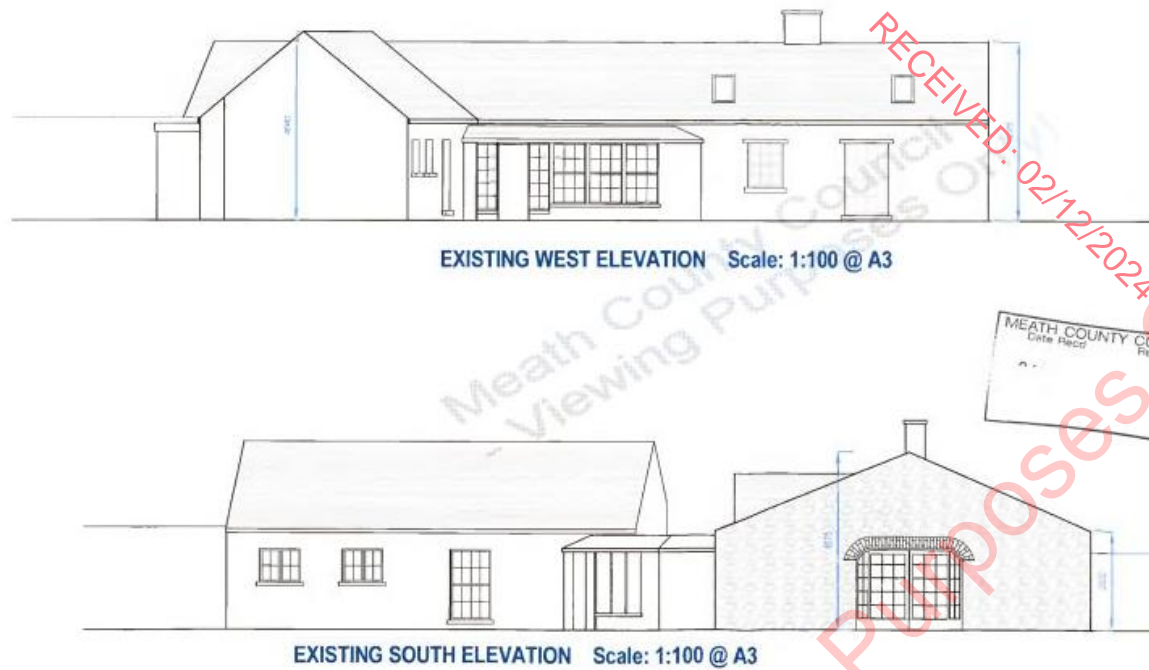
Existing elevations submitted with application under Reg. Ref. 22193
